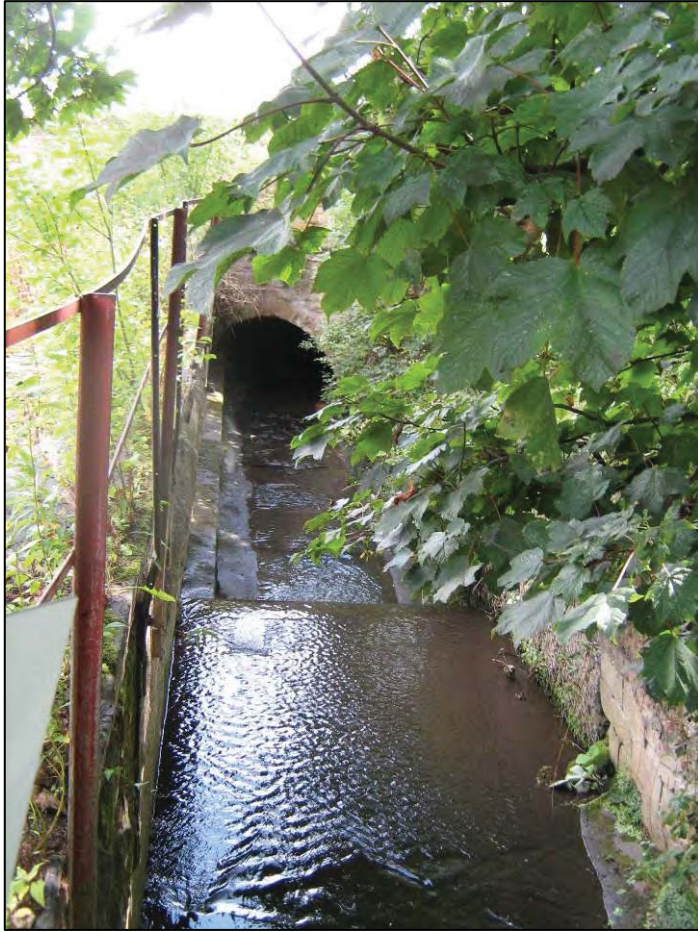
Smithies Beck flowing east into culvert. Concrete channel with vertical stone and concrete banks.
